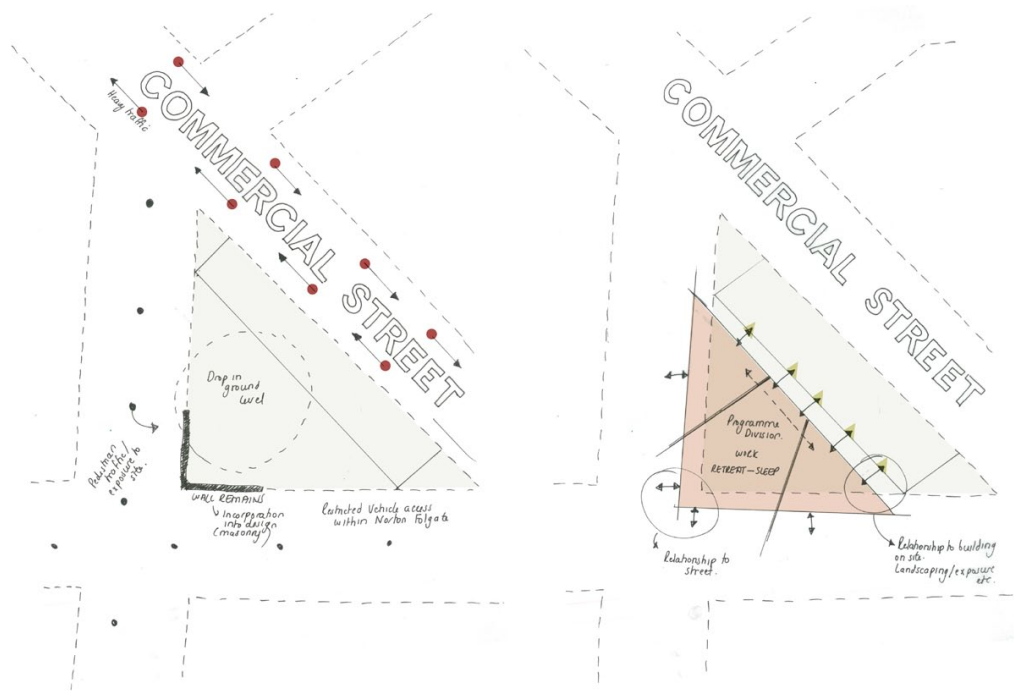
Site analysis showing structure and floor level changes within the existing site.
